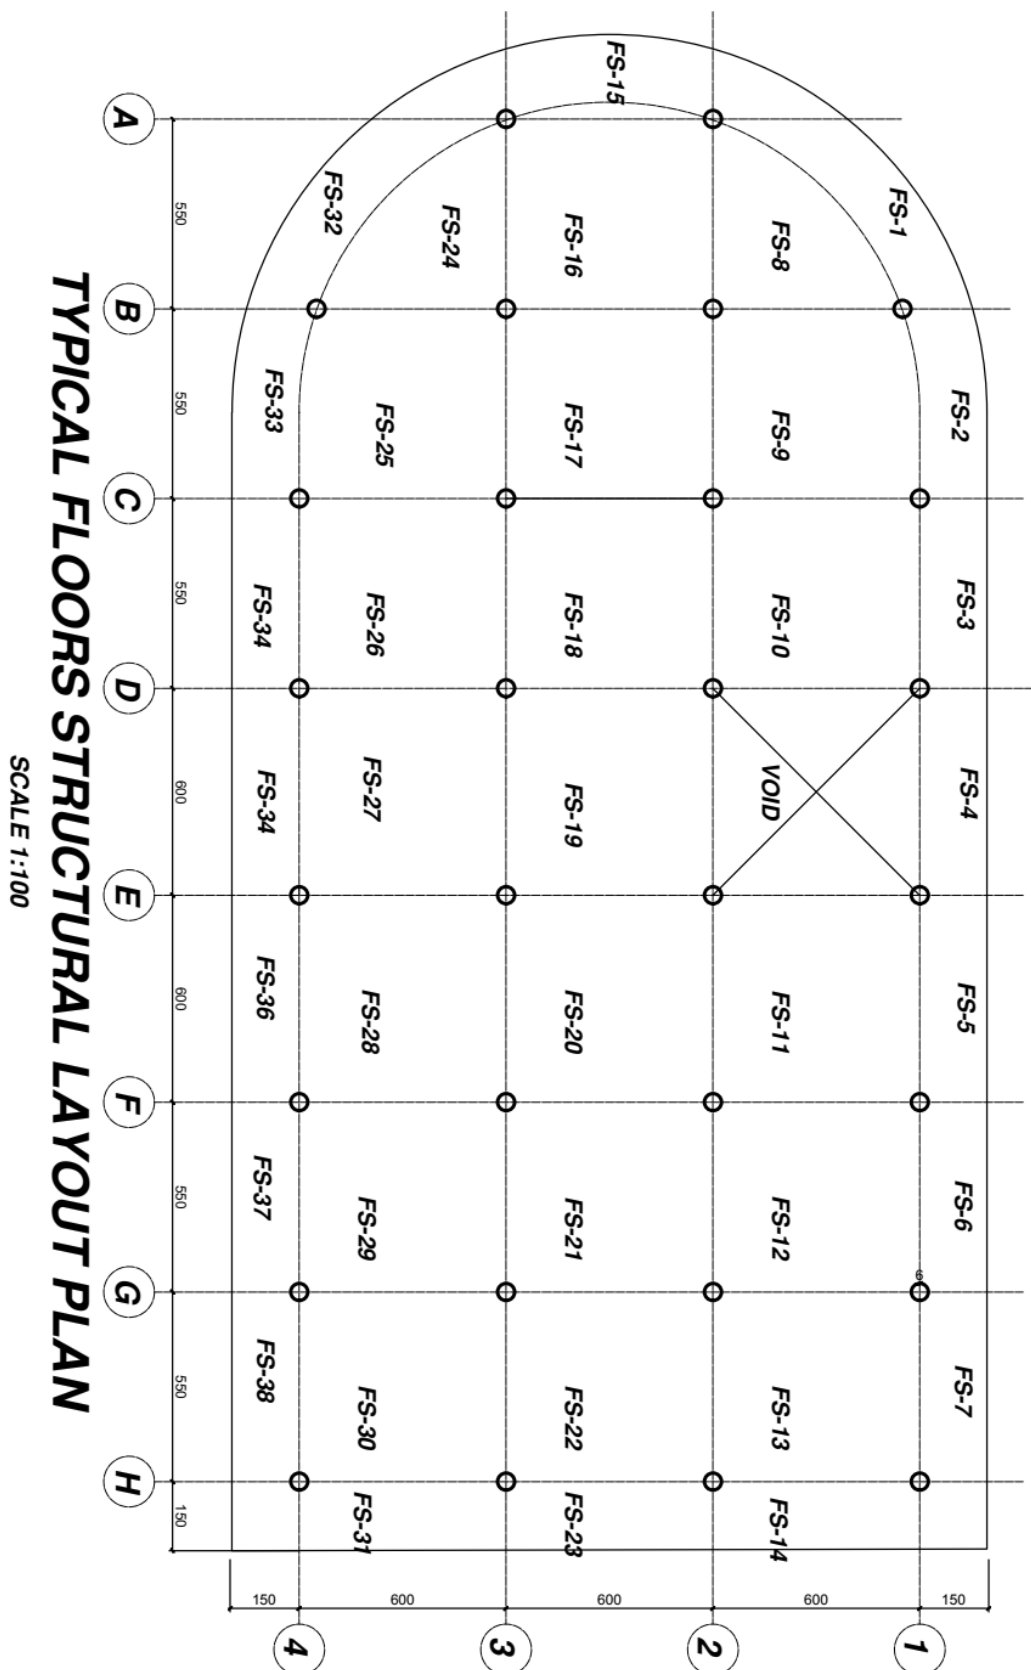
Typical floors structural layout plan for G+2, G+7 & G+12
